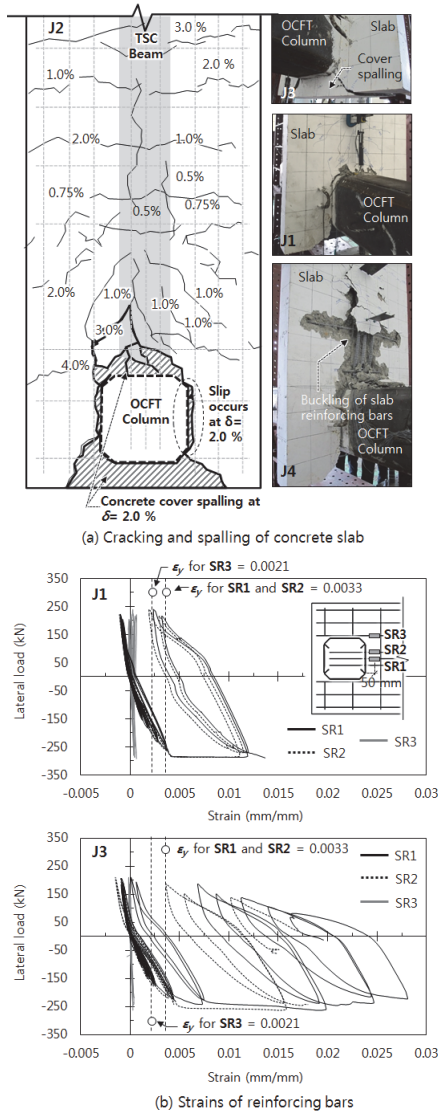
Concrete damage and reinforcement bar strains in slab
